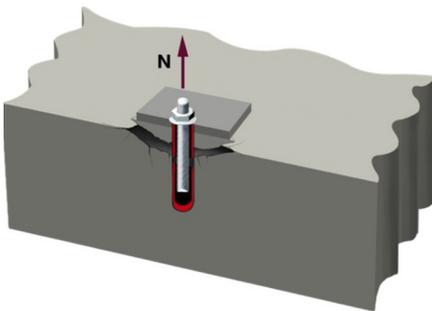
Combined pull-out and concrete cone failure under tension loading
